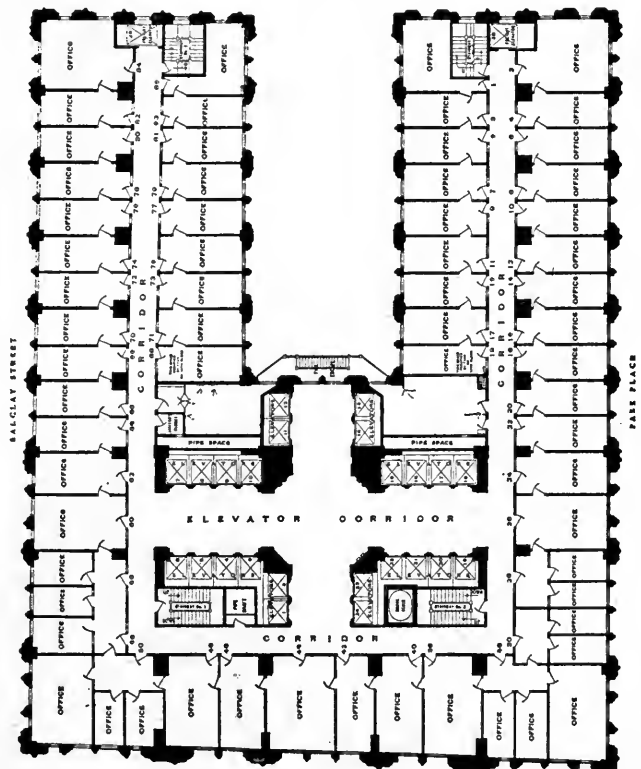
A plan of one of the fifty-five floors of the Woolworth Building
